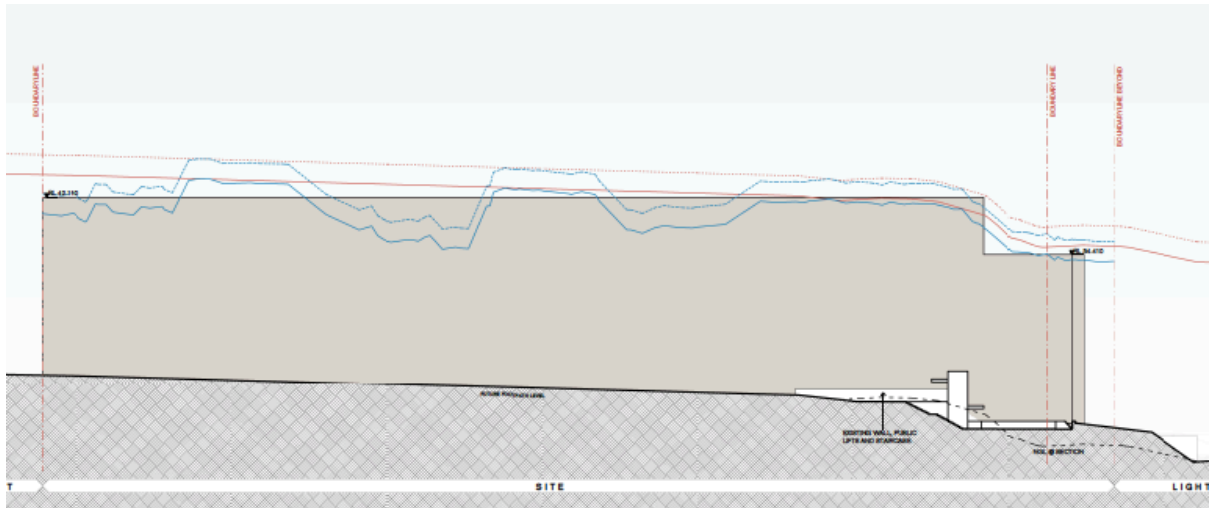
Location and Extent of competitive process – Elevation Jones Street
